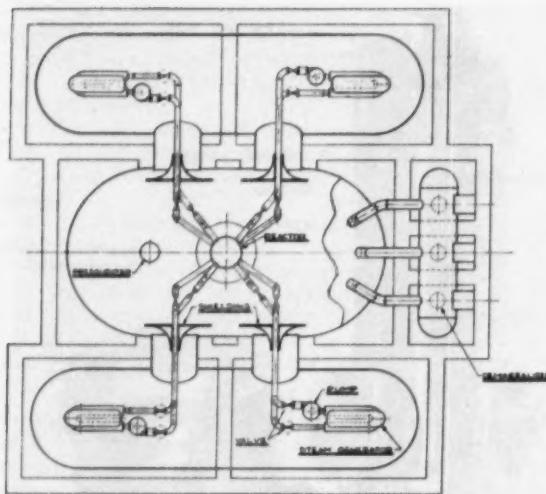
Plan view of a proposed layout for the primary plant showing the concrete shielding, the container housing the primary plant, and the major plant components including the reactor, the pipe, main coolant pumps, and steam generators
